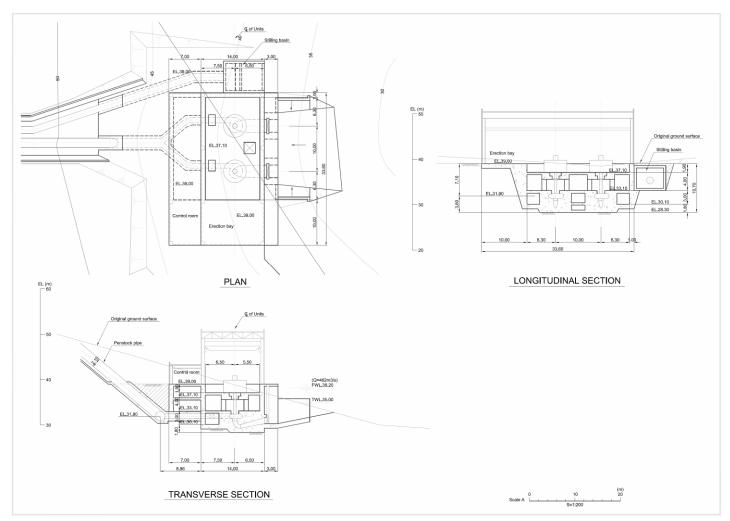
Plan and Sections of No.35-1 Power House
